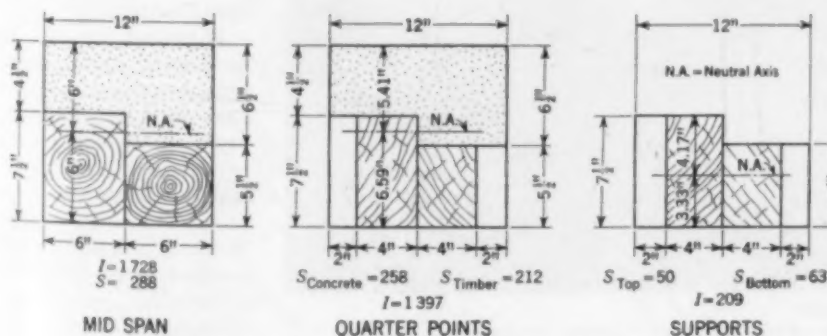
TYPICAL BEAM SECTIONS FOR 18-FT SPANS
